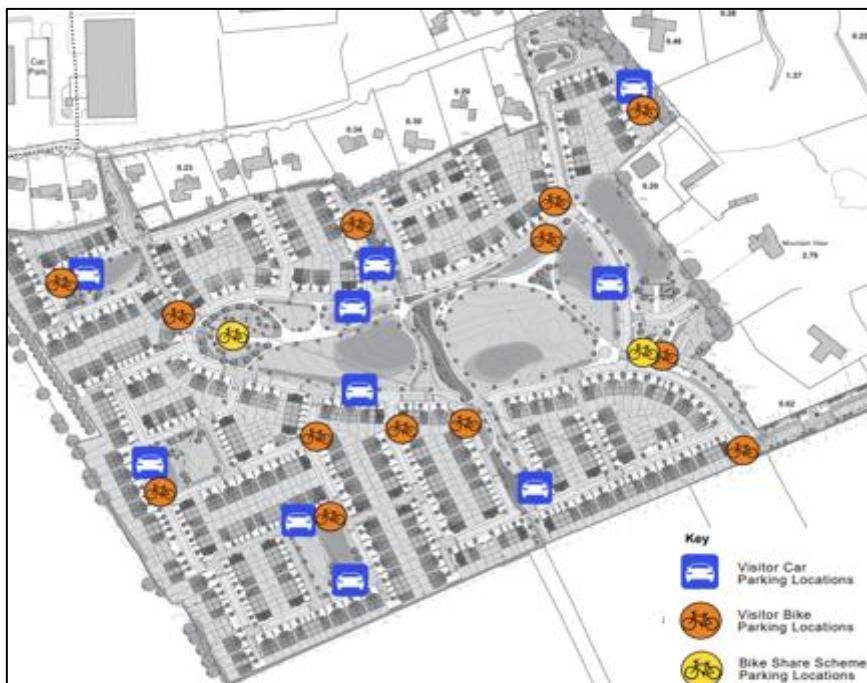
Parking Provision (Extract from JFA, Architectural Design Statement)
